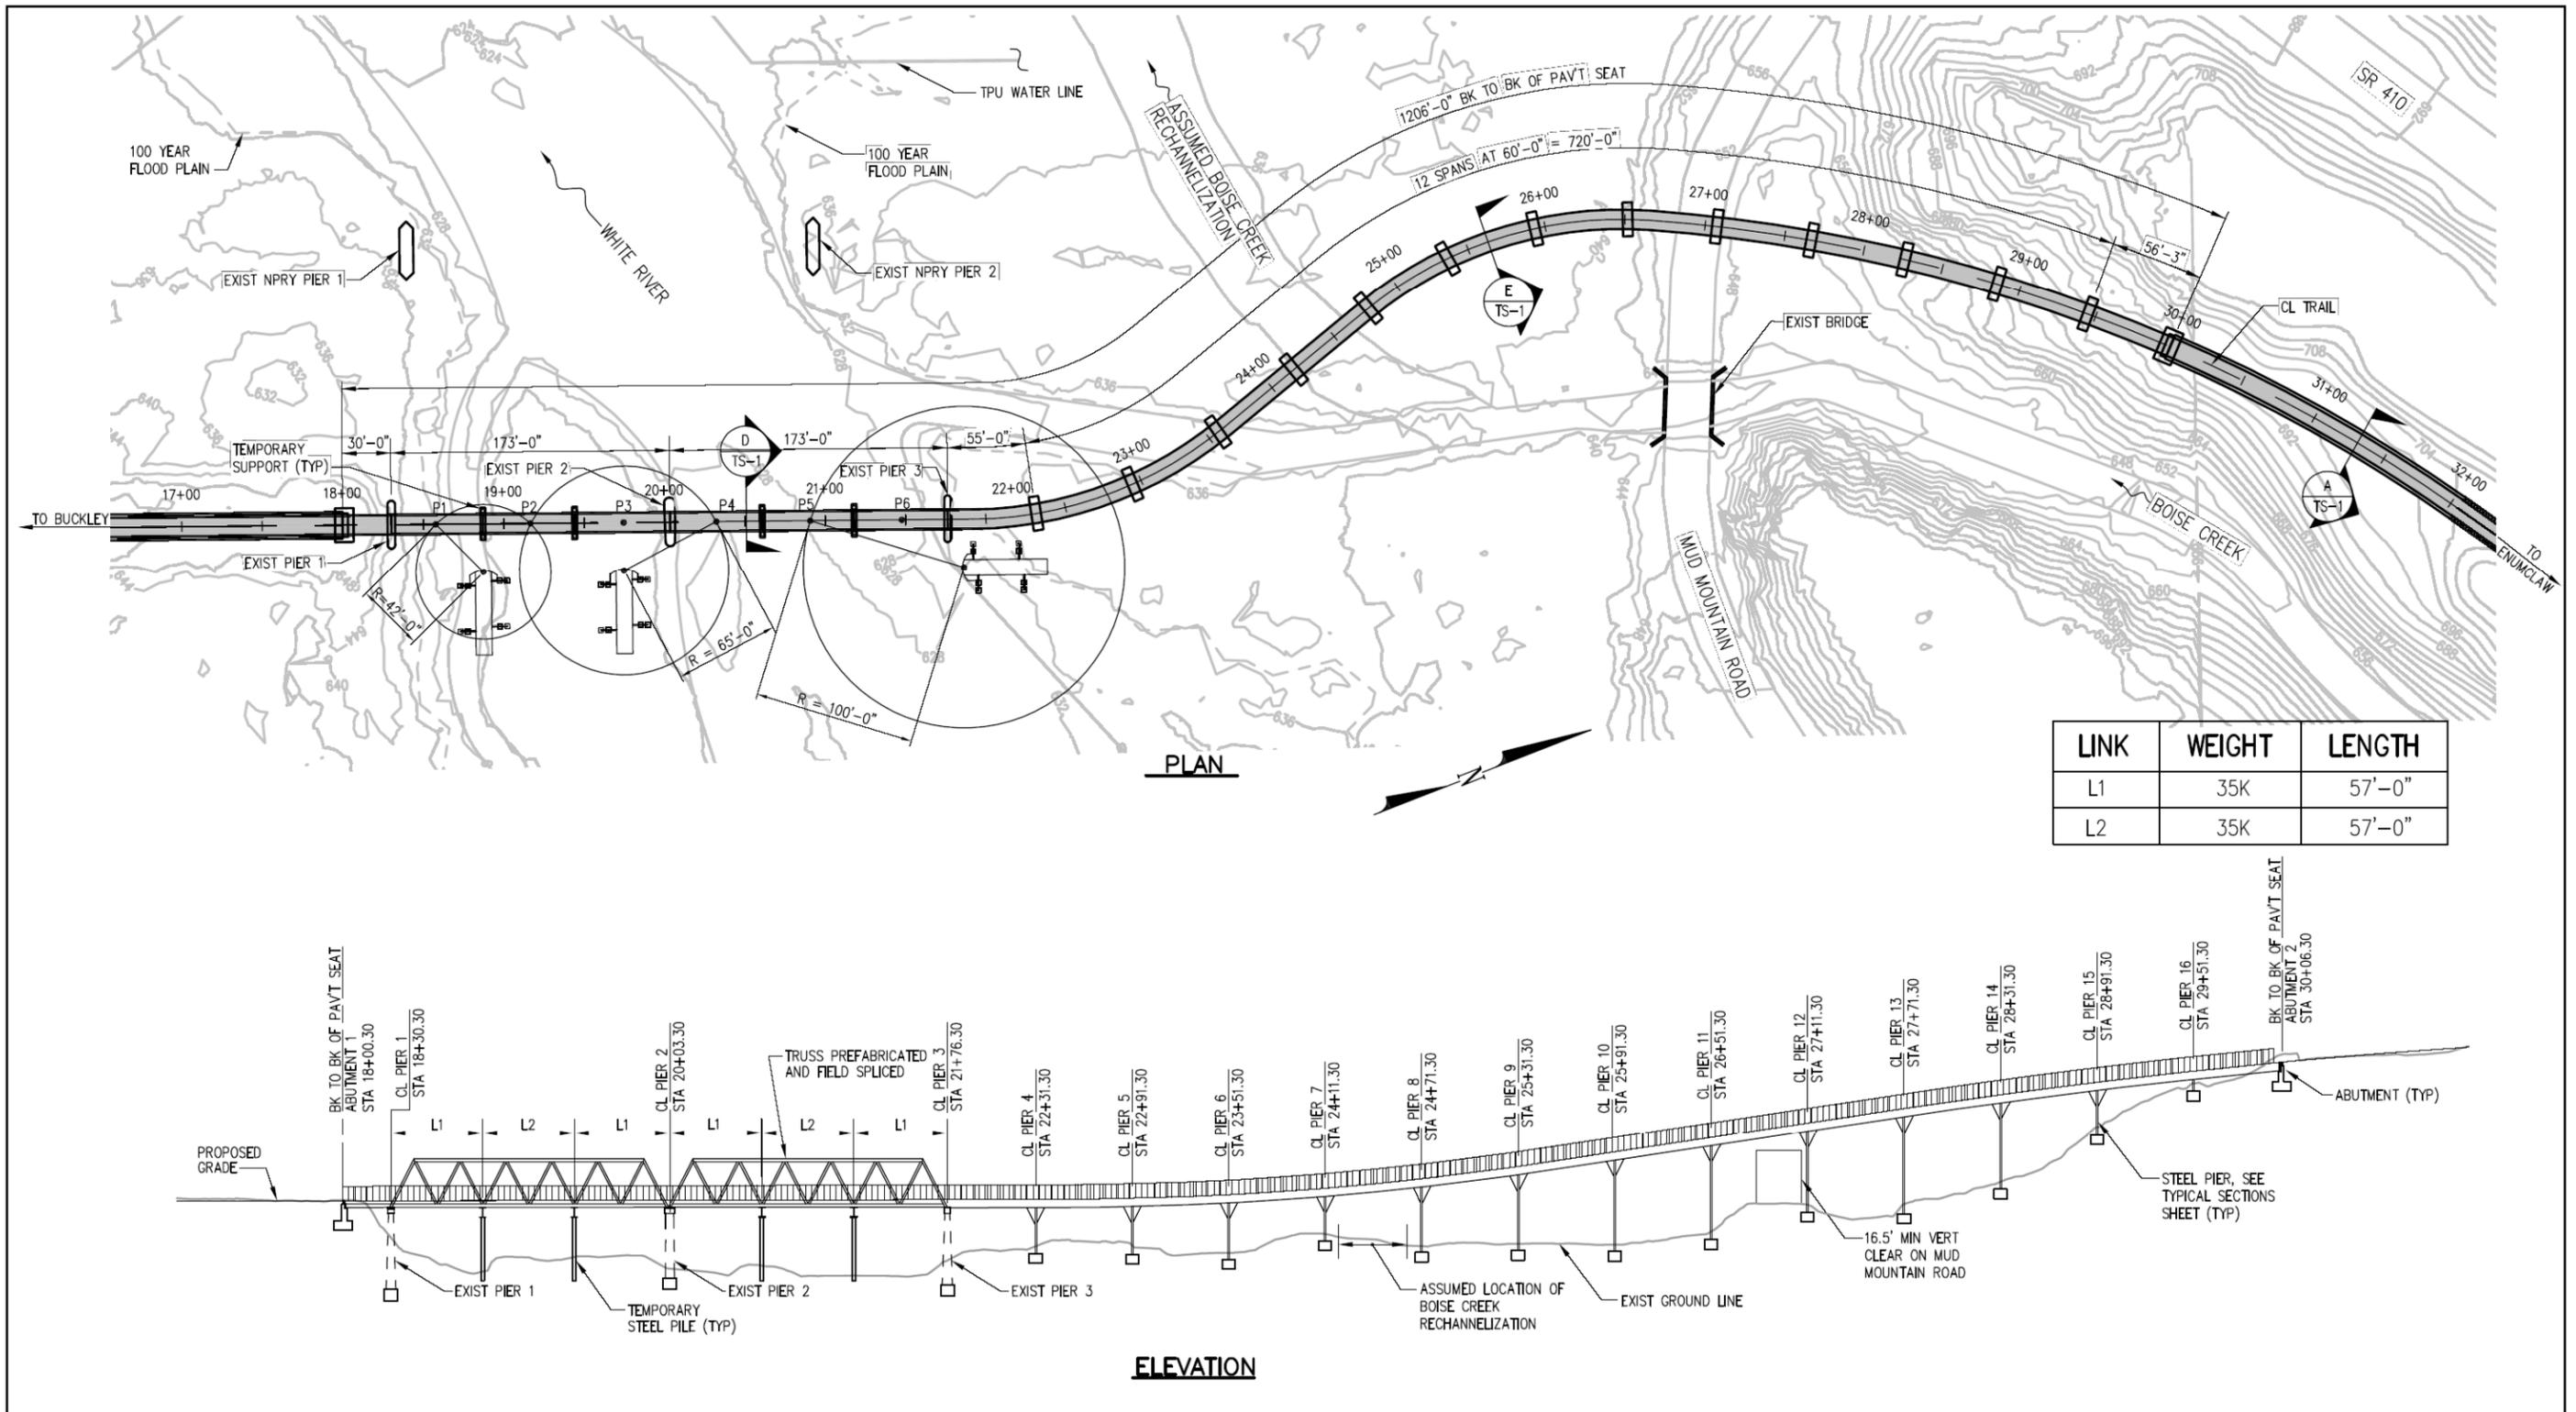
Alignment 1, Prefabricated Parallel Truss
